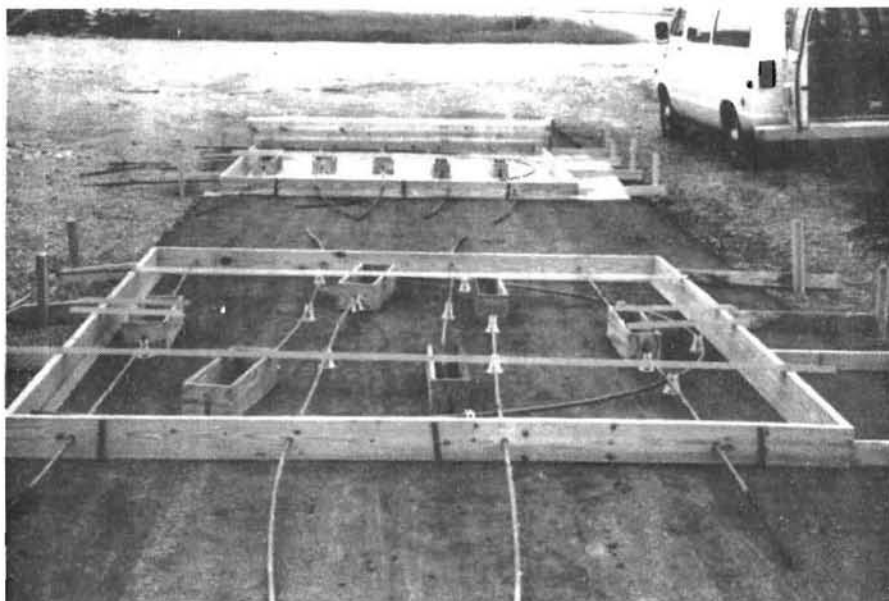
Layout of Test Slab No. 2 before casting the concrete.
